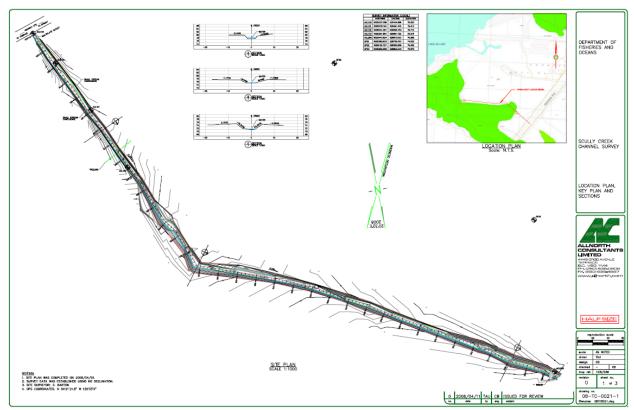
Allnorth site survey plan view of Scully Mid Channel (or Hotsprings Channel)
